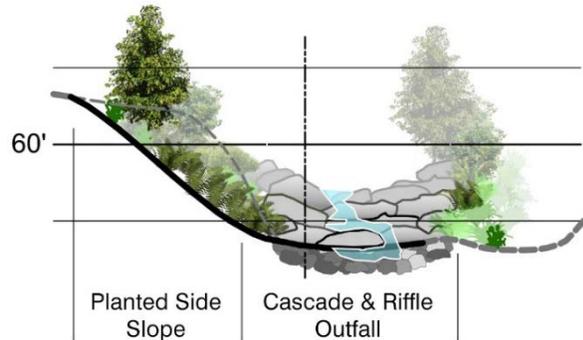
Section D-D' cut northward at STA 1+58 following the existing C.L. which cuts through the outfall riffle looking towards the final cascade
